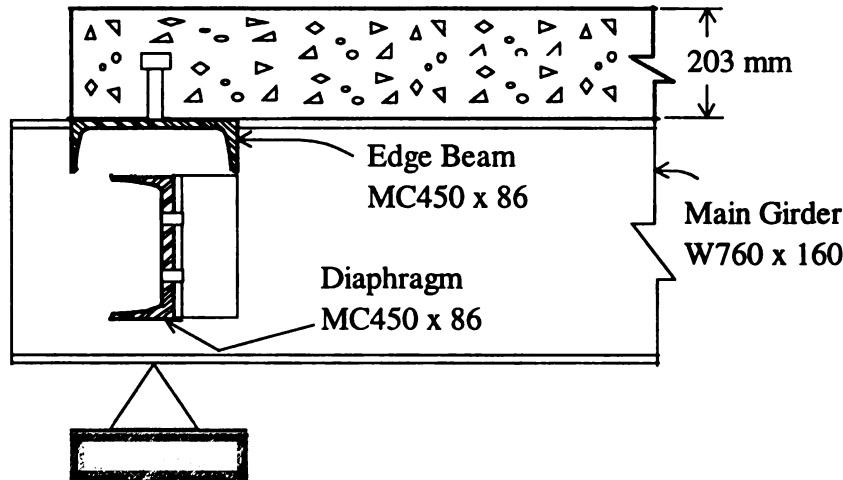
Longitudinal Section Showing Edge Beam and Diaphragm
